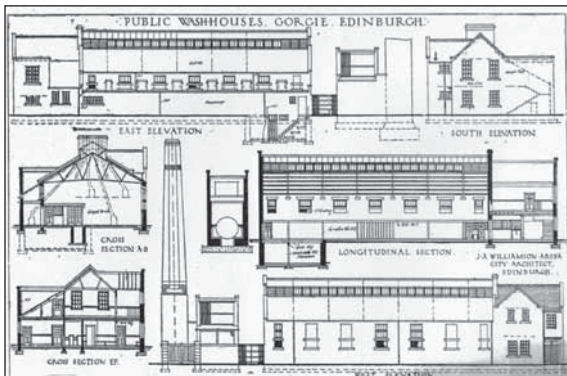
Elevations and sections of McLeod Street Public Washhouse, Gorgie. (*Building News*, February 21 1917.)
